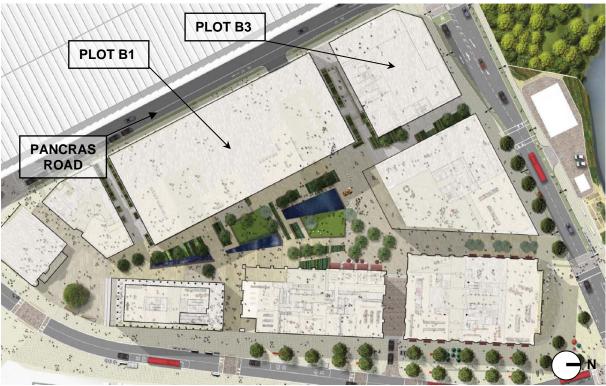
Zone B of the Kings Cross Masterplan, with plot B1 highlighted
